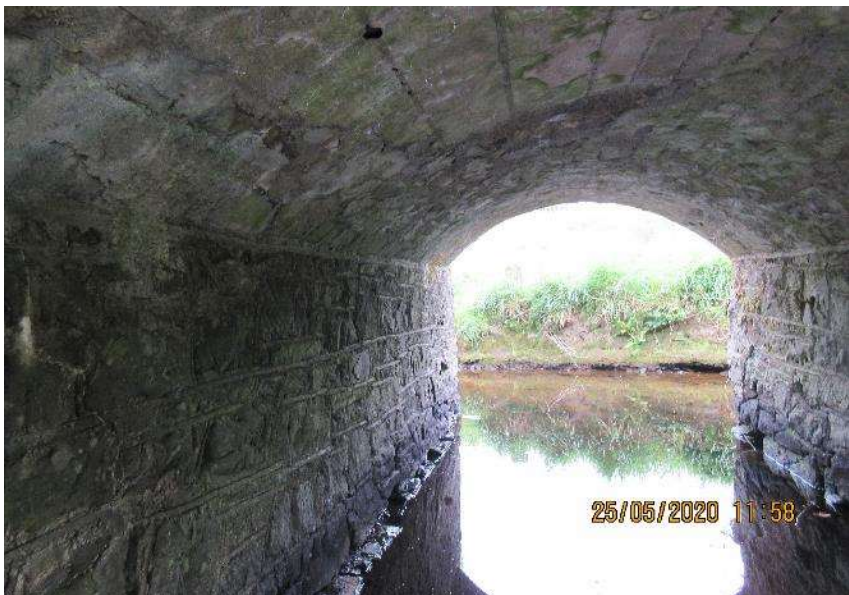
Southernmost arch (as seen from downriver elevation) showing the soffit and pointing and render repairs.
